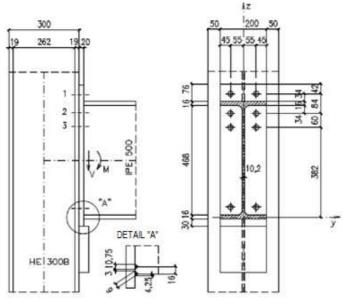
Analyzed beam-to column joint with bolts M20-10.9
